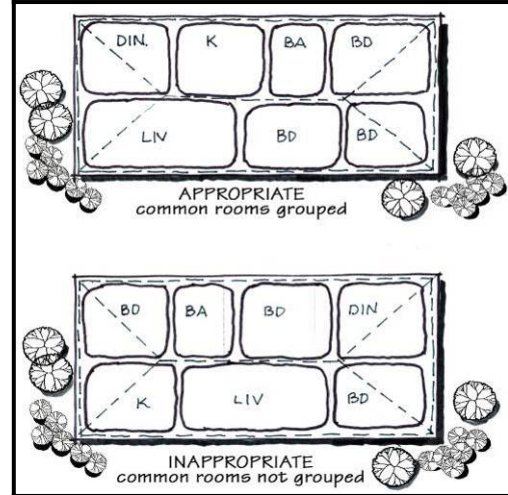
Room additions should be functionally integrated into the overall floorplan
